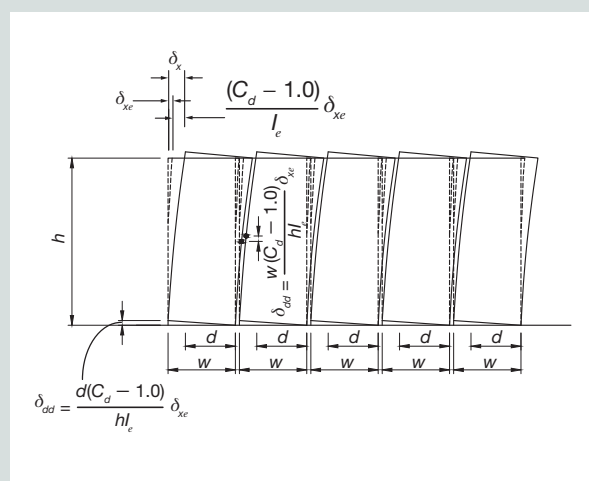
Ductilely connected series of intermediate precast concrete shear walls.
